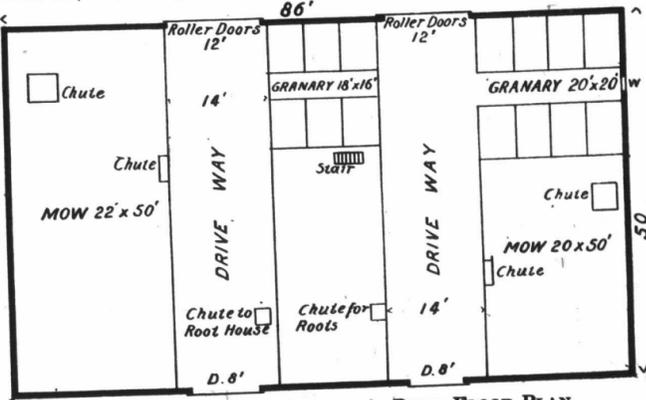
FIG. I.—MR. JOHN MORRISON'S BARN FLOOR PLAN.
